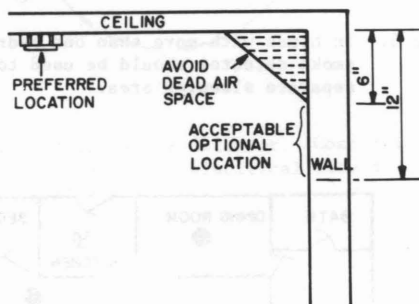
Mount wall detector units between 6 inches and 12 inches from ceiling.
